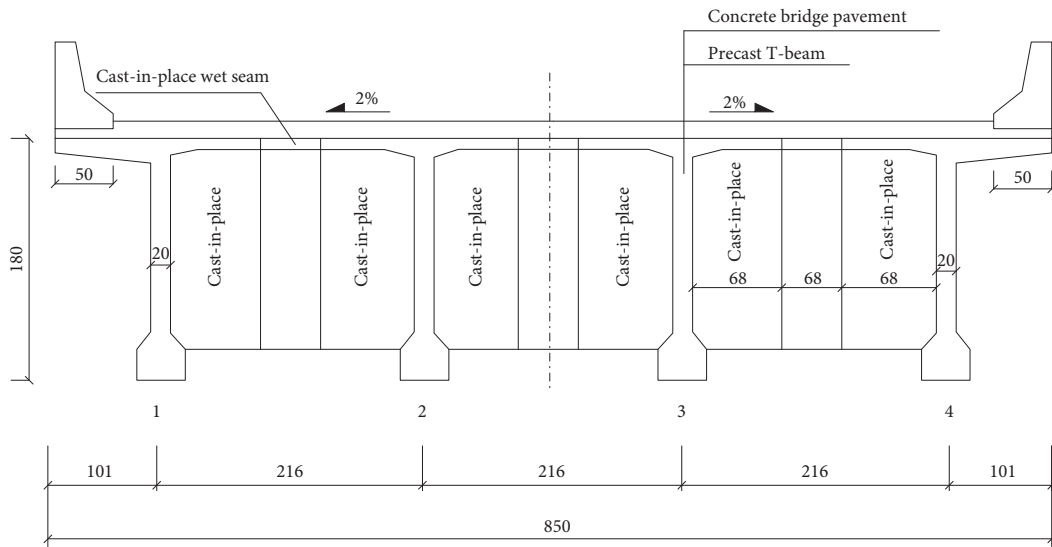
Cross-section of Shangban Bridge (dimensions in cm).
